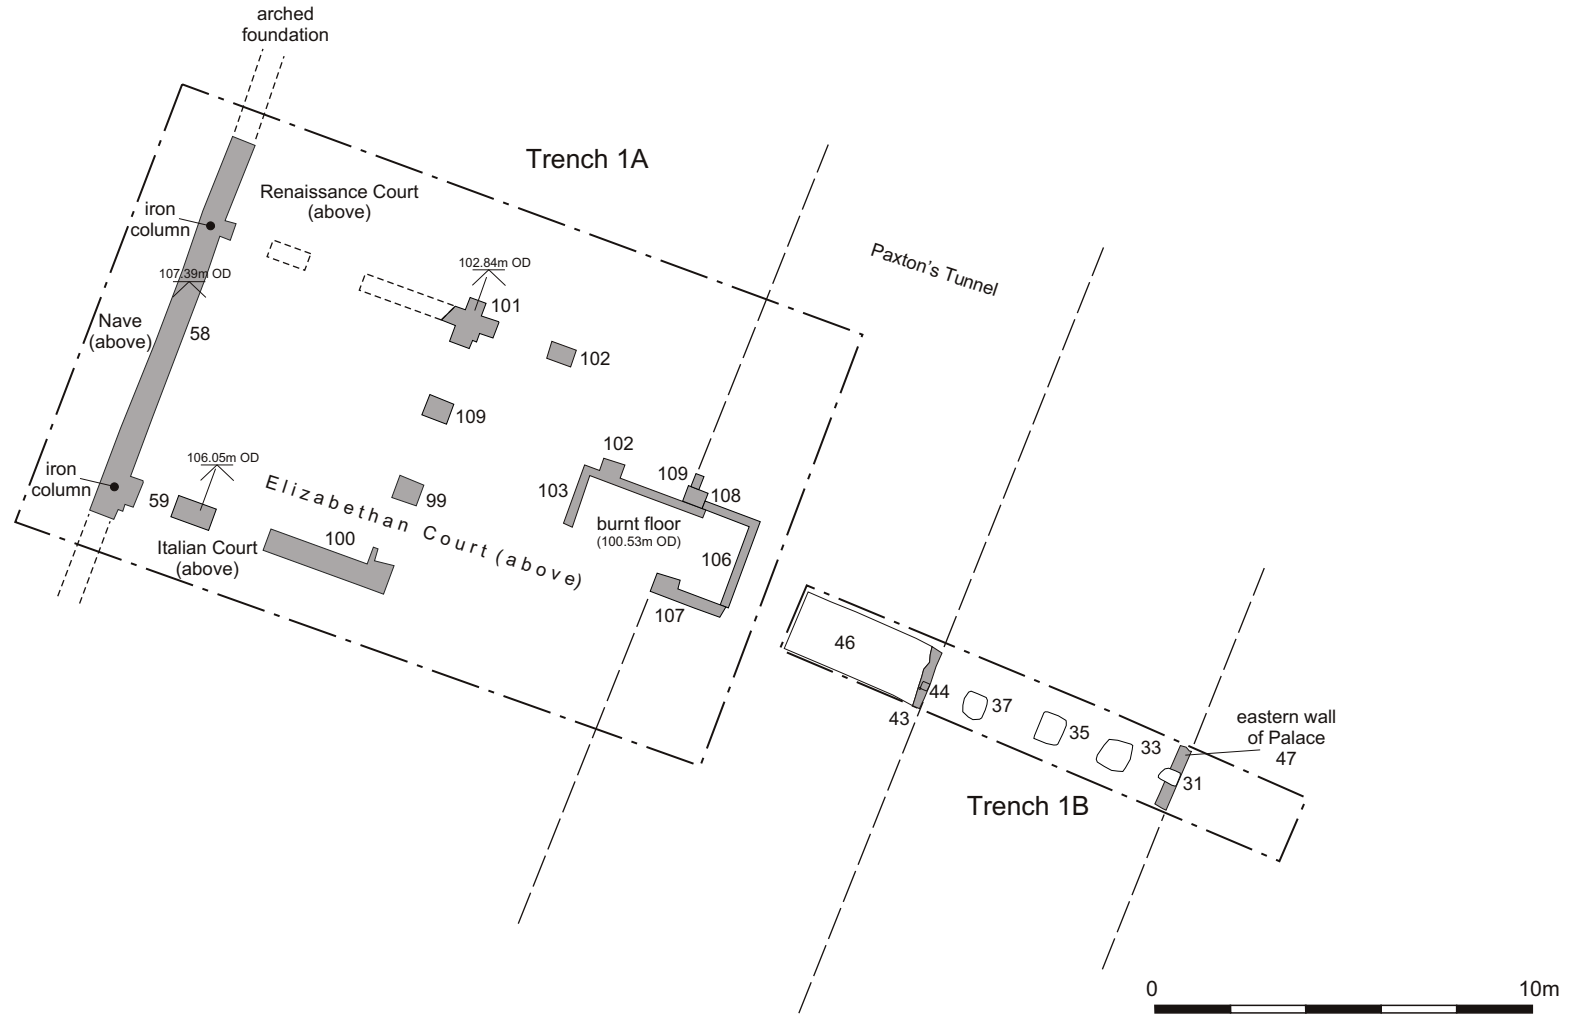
Trenches 1A and 1B, plan of structural features from the Palace
